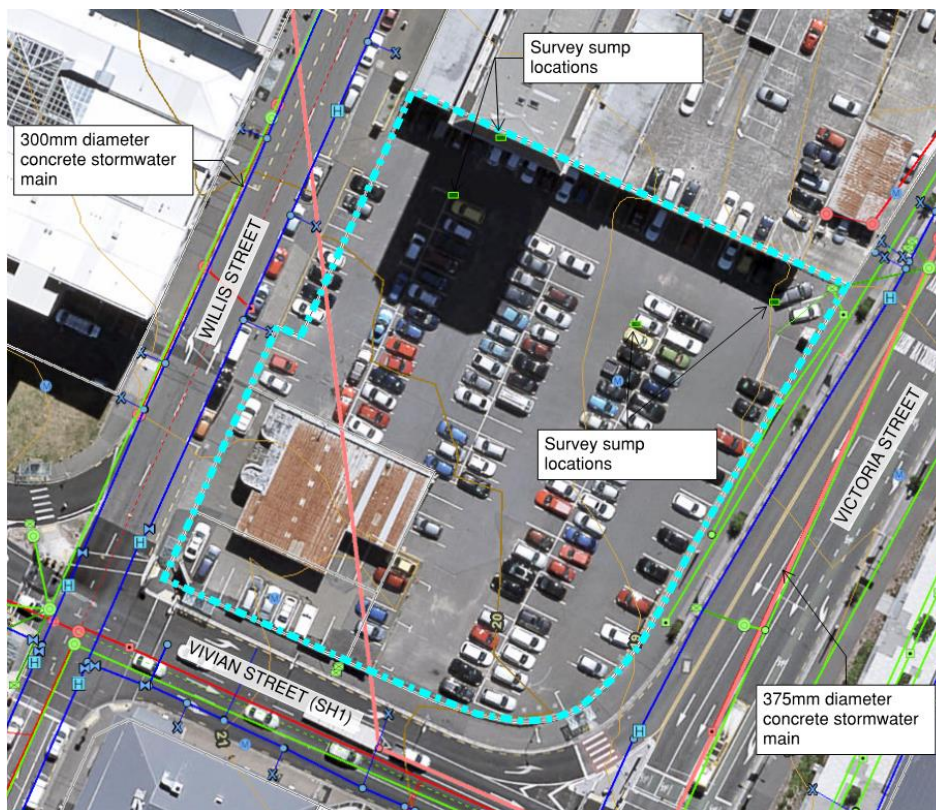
Stormwater Drainage Overview (Source: WCC GIS)
